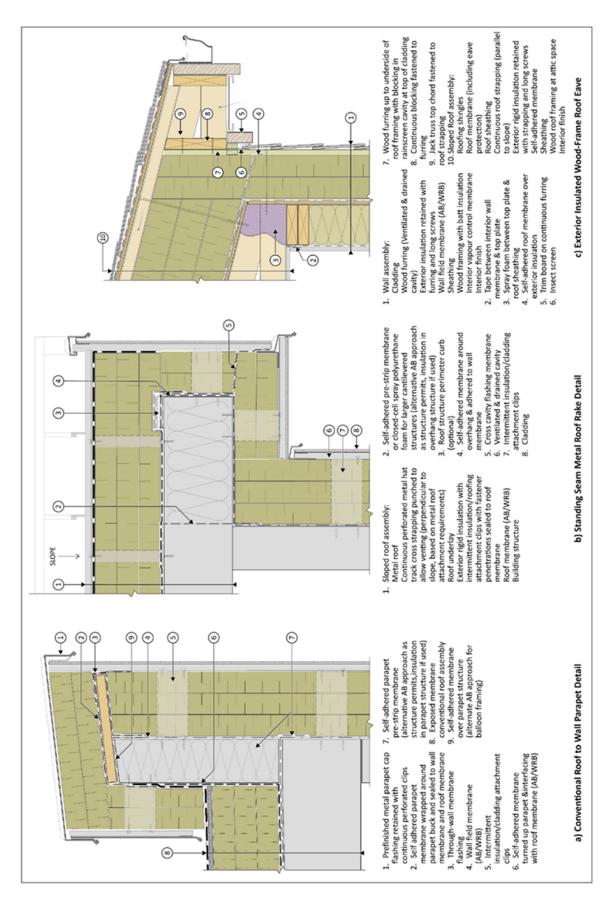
Schematic roof-to-wall details showing key design elements for high-performance detailing. In particular, note the continuity of control layers including the air barrier systems and the insulation in each of the details.
